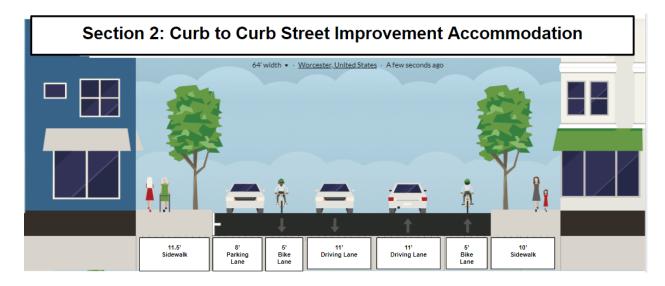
Curb to Curb Street Improvement Accommodation, Section 2
